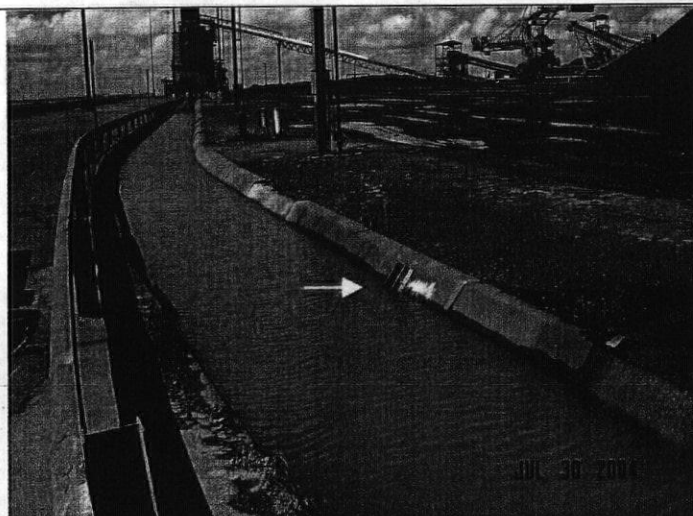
Ditch system around the facility. The arrow points to a location where railroad ties have been added.
